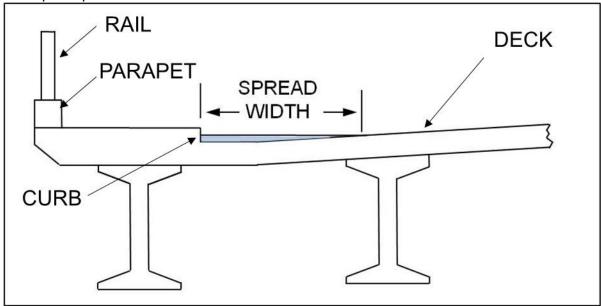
Sketch illustrating spread width of bridge deck drainage.
